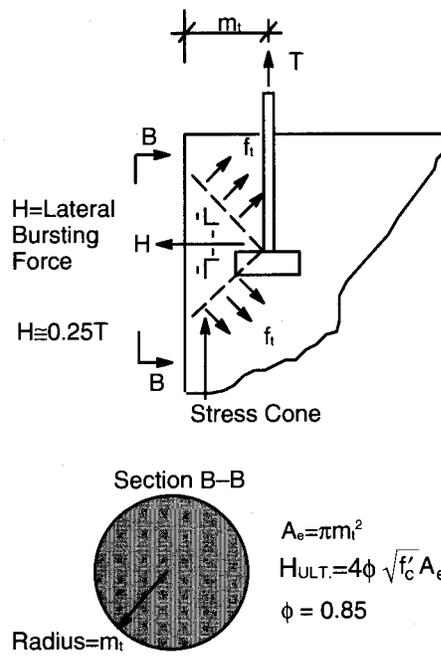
Design Check for Lateral Bursting Forces for Anchor Bolts in Tension Located near an Edge
